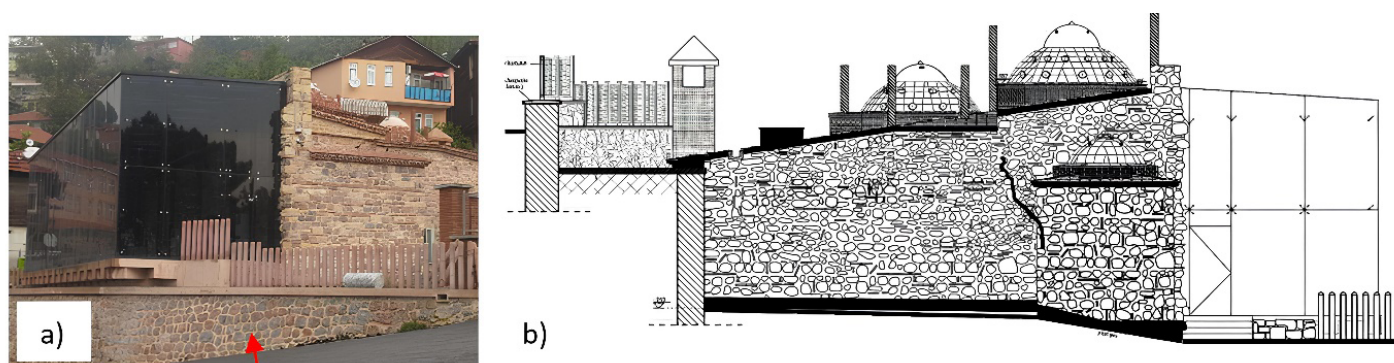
a) Süleyman Pasha Bath sections after repair b) Suleyman Pasha Bath Northwest Facade. Source: Güner Design - Architect Gülhan Dilaver.
